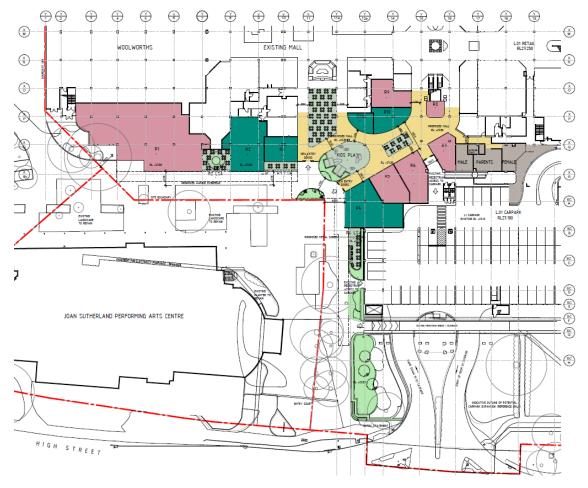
Part Level 1 plan showing the proposed new construction on Level 1
